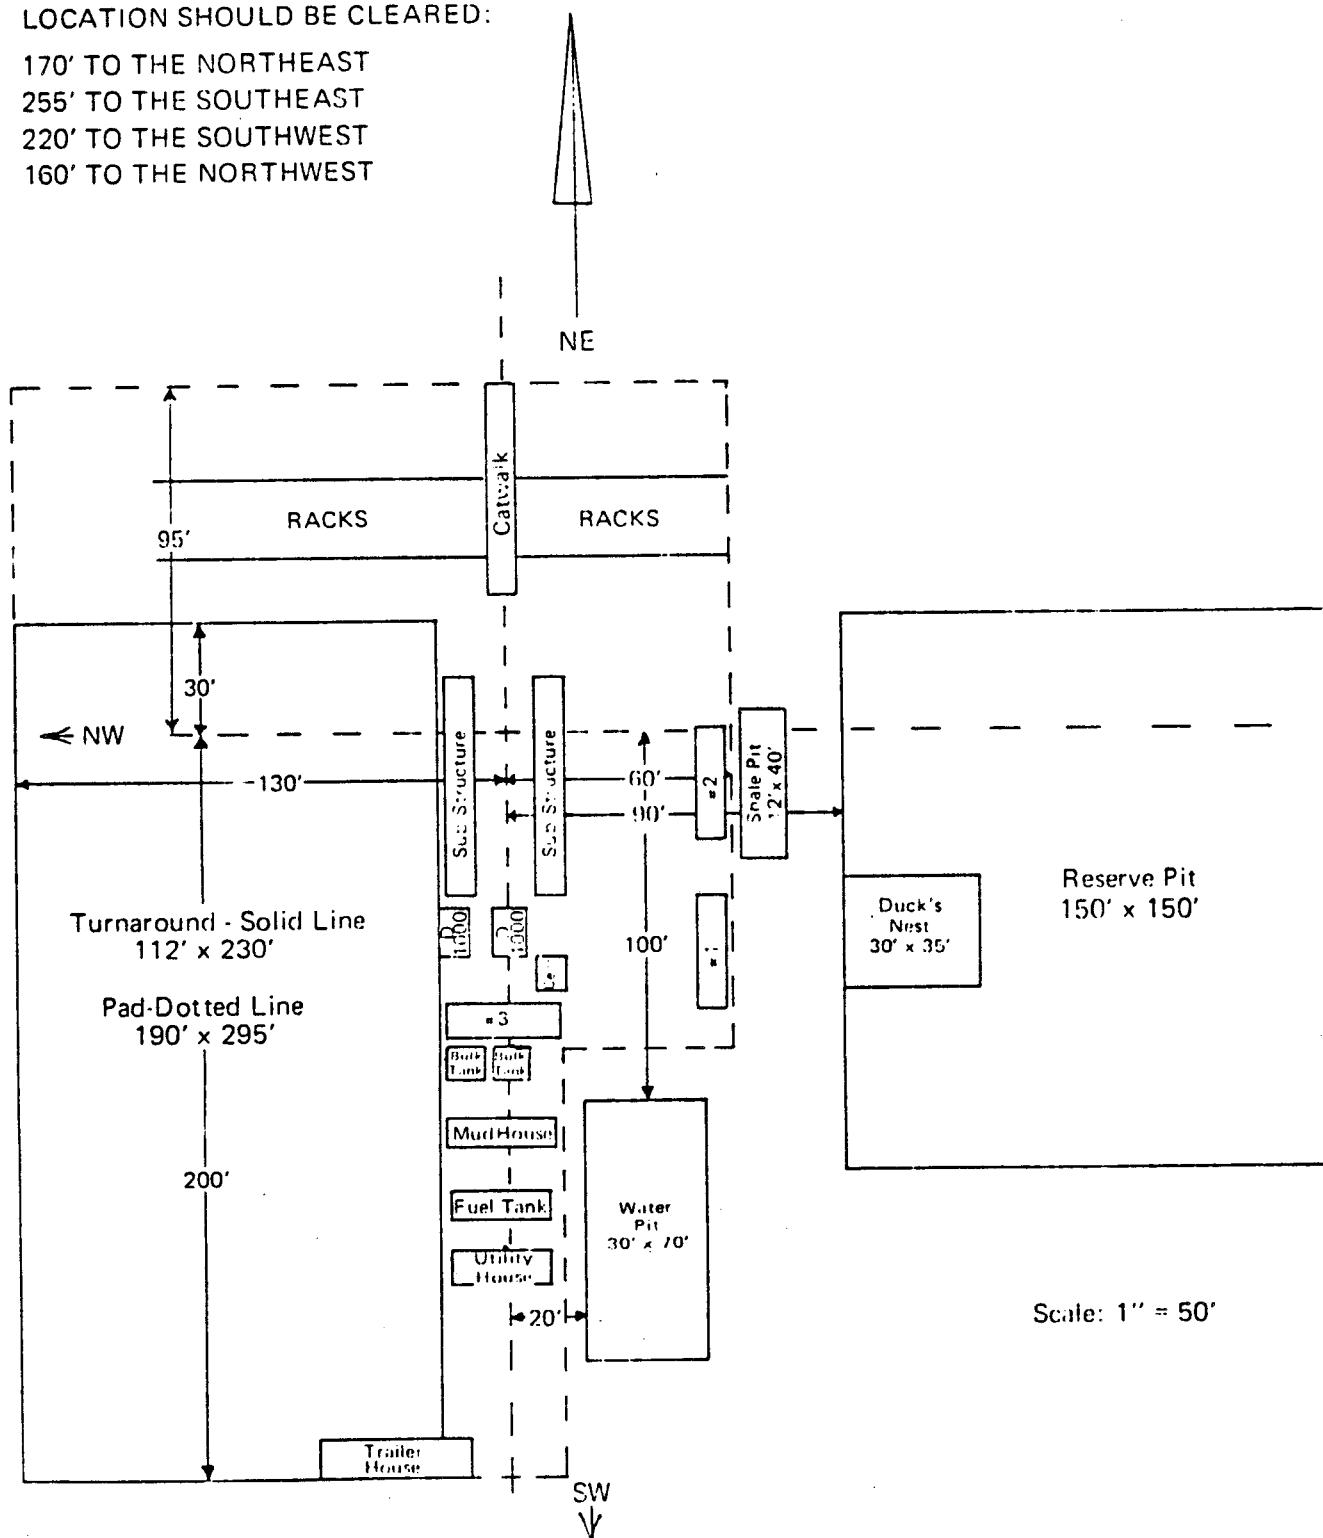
Typical drilling site arrangement (General Crude Oil Company, 1977).
